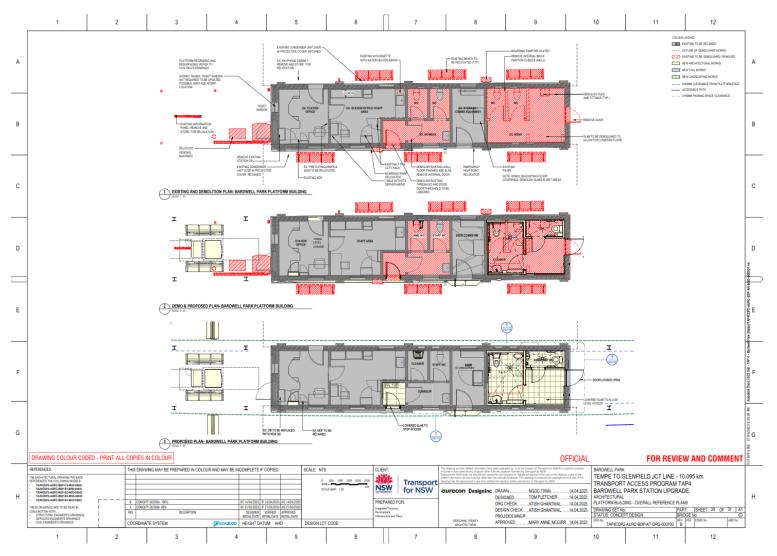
Existing, demolition and proposed plan for Platform Building at Bardwell Park Station (Source: Aurecon, 2024)
